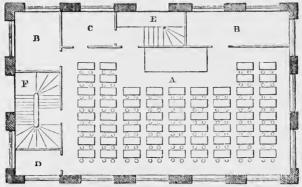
Plan of First Floor, adapted to Fig. 150.
